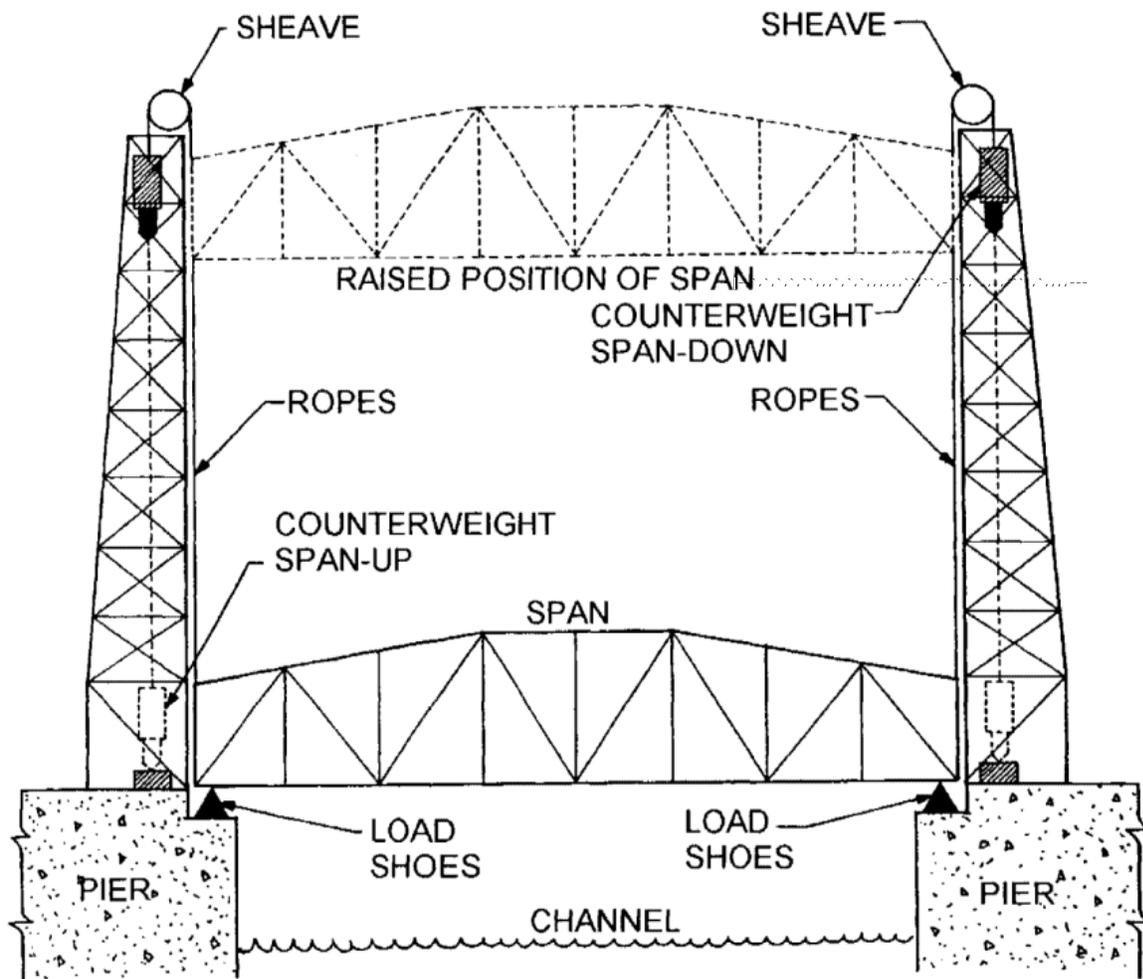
Closed span rests on load shoes; as span is raised, the counterweights descend
